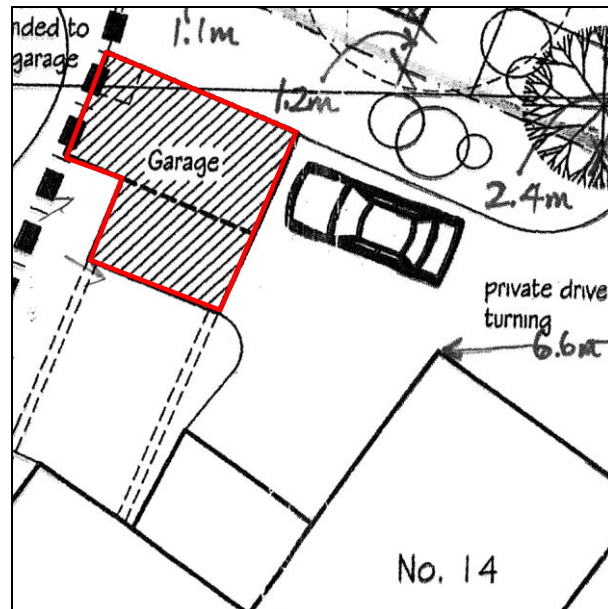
Plan of new garage on site of demolished outbuilding. Supplied by developer, not shown to scale.
